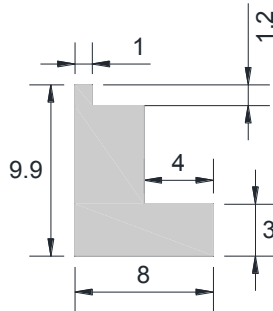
Cross section of the crown wall for a single-layer Cubipod[®] armored breakwater.
